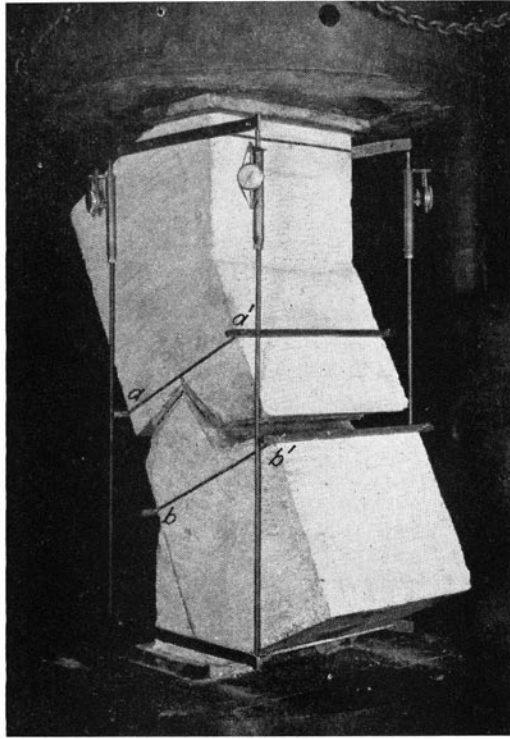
OBLIQUE LOAD SPECIMEN IN TESTING MACHINE
